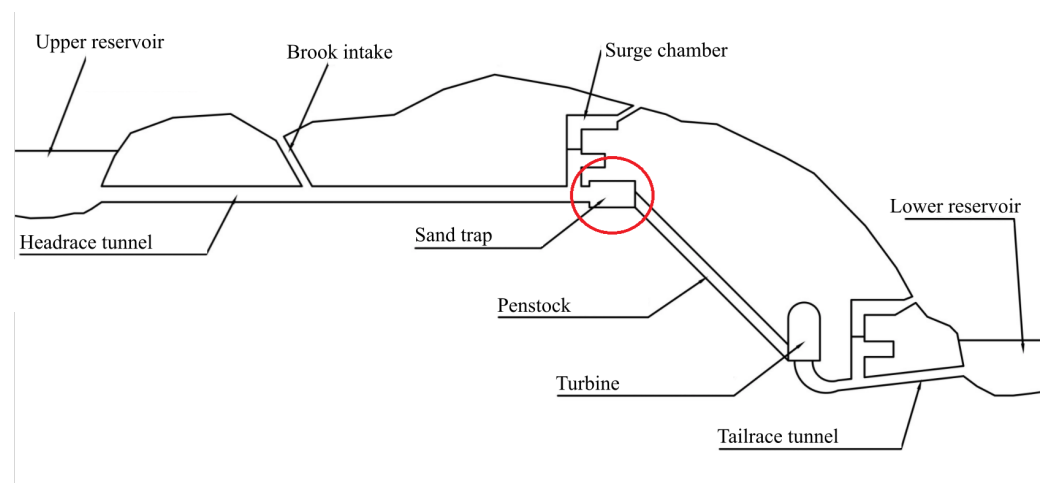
Layout of a typical high-head hydropower plant. The sand trap is marked with red color.
